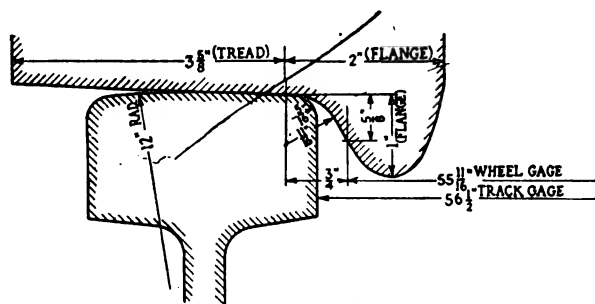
Detail of rail and wheel flange, showing where gage is measured
